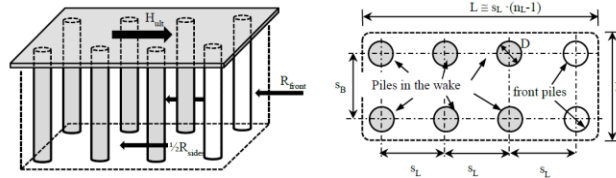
Autocad Plan view of the Group of pile under the bridge
